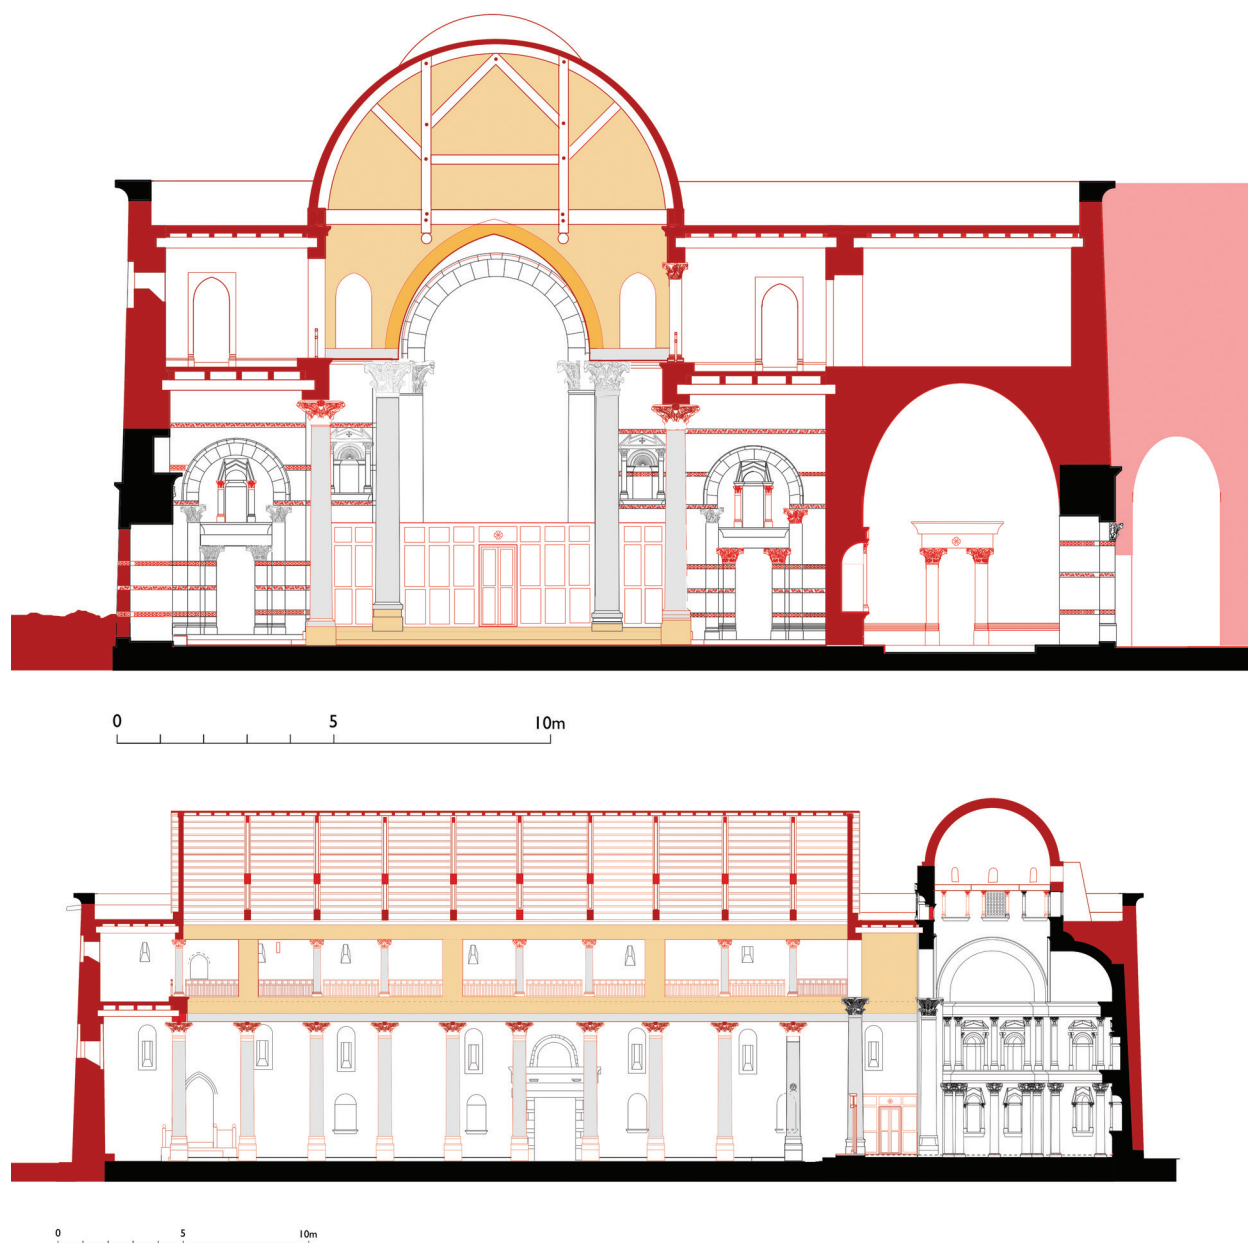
Reconstructed sections through the medieval church. Top: north-south section looking east through the nave and south hall showing barrel roof; bottom: west-east section looking north through the nave showing gallery arcades with piers and columns, no clerestory, and replacement dome over triconch (drawing: author, 2016)
